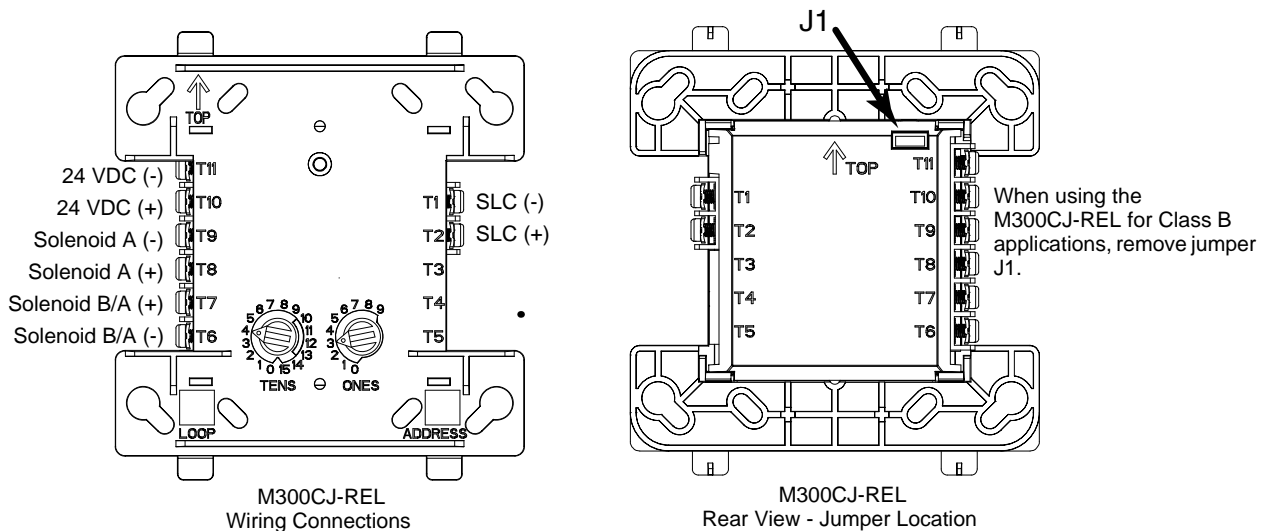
M300CJ-REL Wiring Connections and Rear View - Jumper Location
